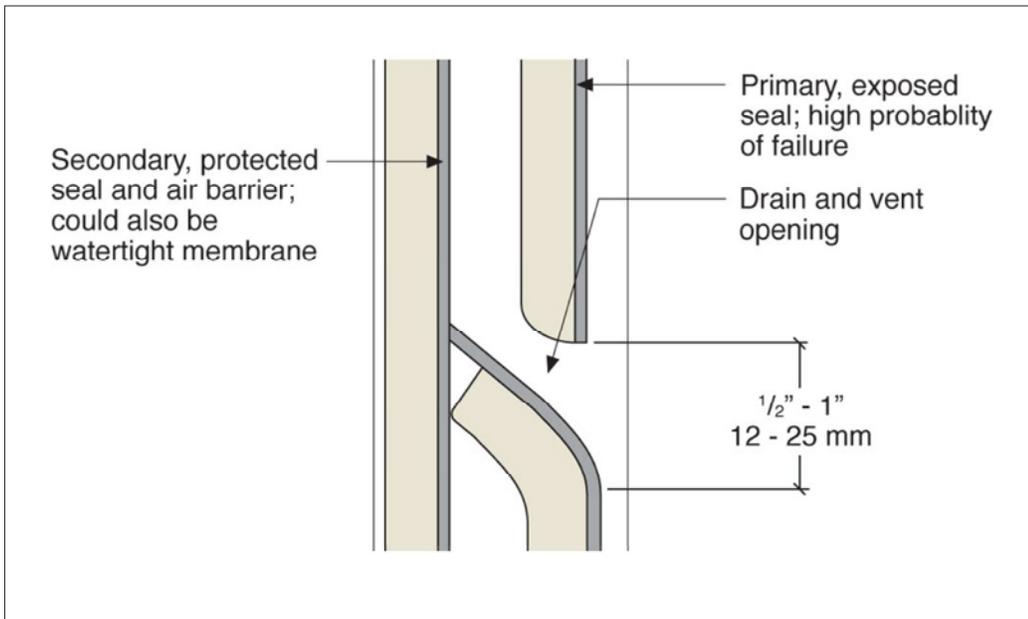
Details of a two-stage joint at a drainage/vent hole. Source: Image copyright RDH Building Science Inc., used with permission
